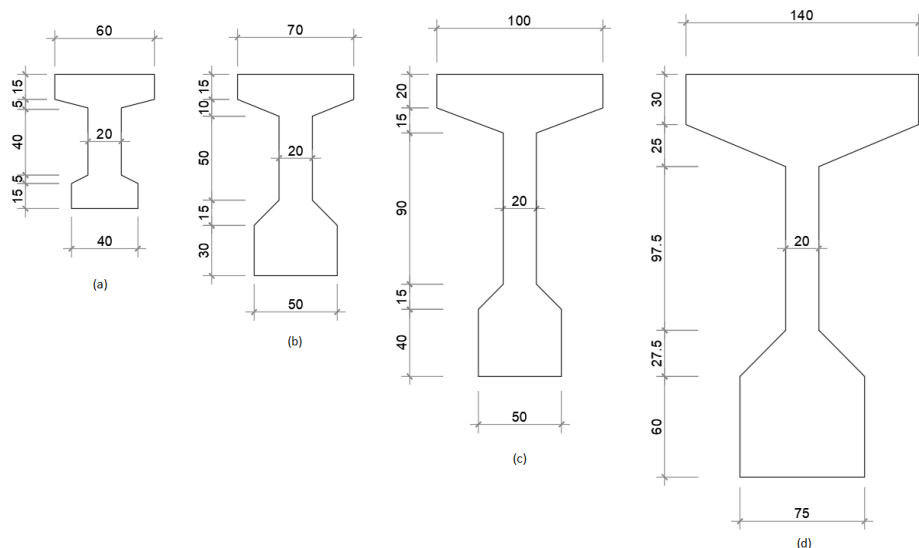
Cross section of bridge girder beams. Dimensions in cm.
